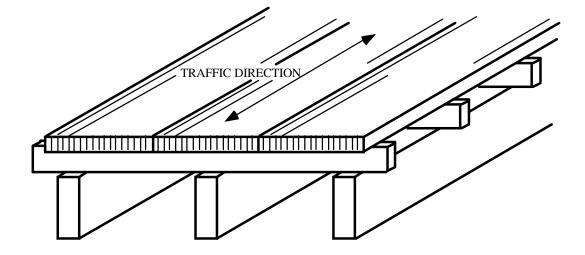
Stringer Bridge, Deck Parallel to Traffic.
